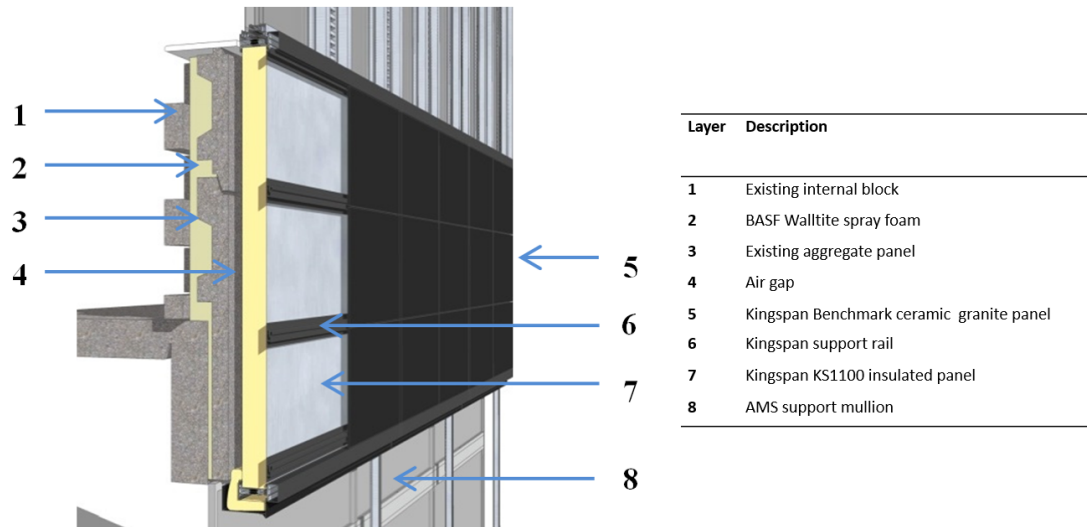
External retrofit opaque wall construction build up. (reproduced courtesy of Henry J Lyons Architects)
